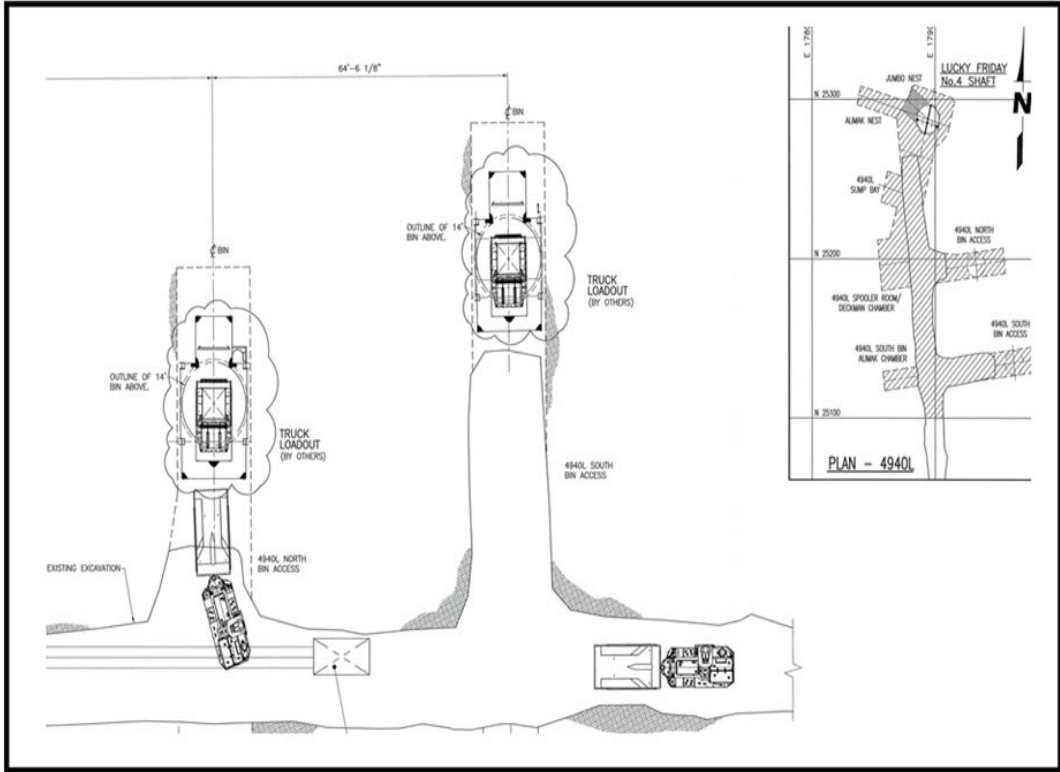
Plan View of North (Ore) and South (Waste) Bins on 4940 Level
